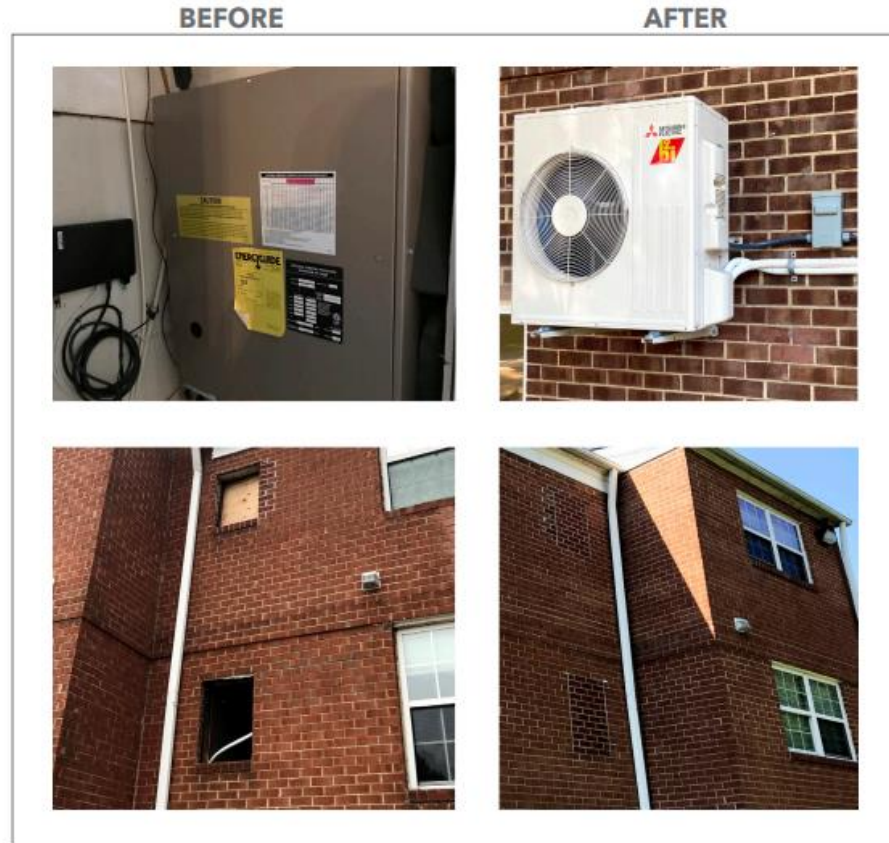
Equipment and exterior facade of multifamily building before and after heat pumps installation¹¹²
